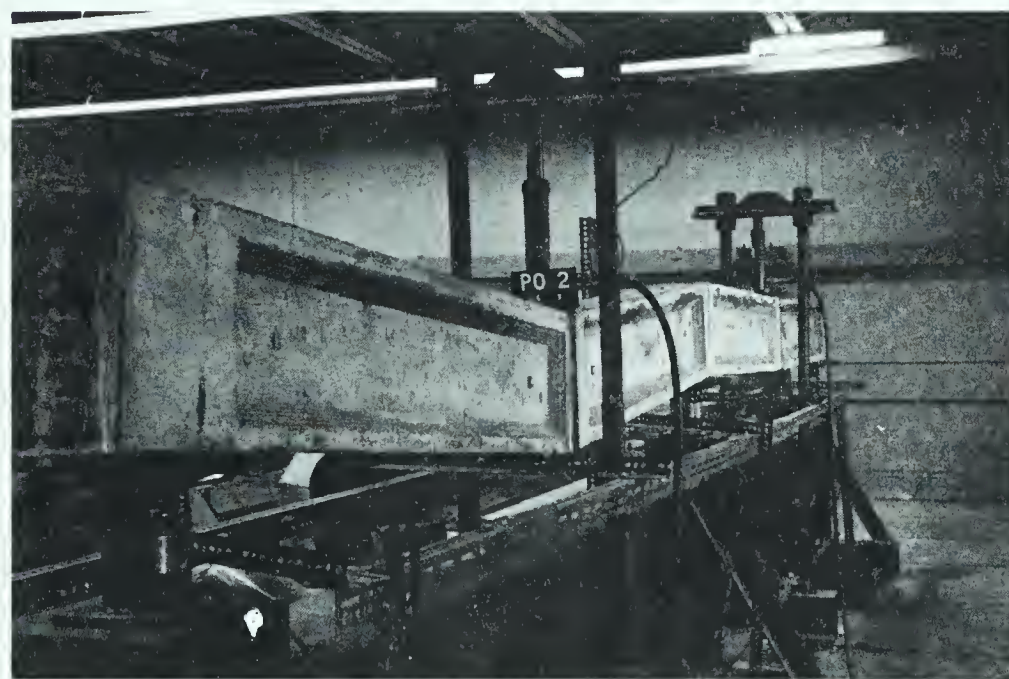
(a) PHOTOGRAPHS OF BEAMS AFTER FAILURE
